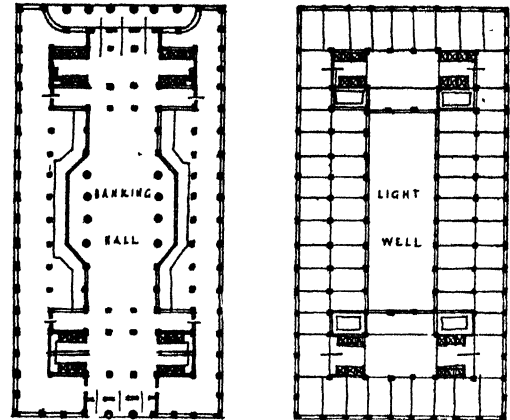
PRINCIPAL AND TYPICAL UPPER FLOOR PLANS OF AN AMERICAN BANK AND OFFICE BUILDING
